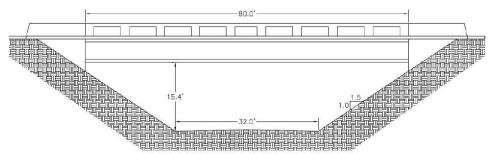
Schematic elevation drawing of Utah Pilot Bridge.
